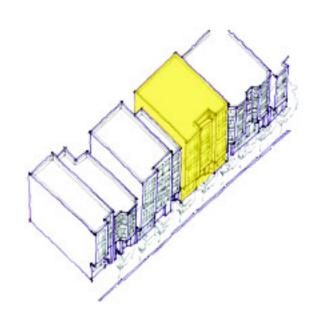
Mixed-Use Buildings built to the sireetfront to activate the ground-floor
